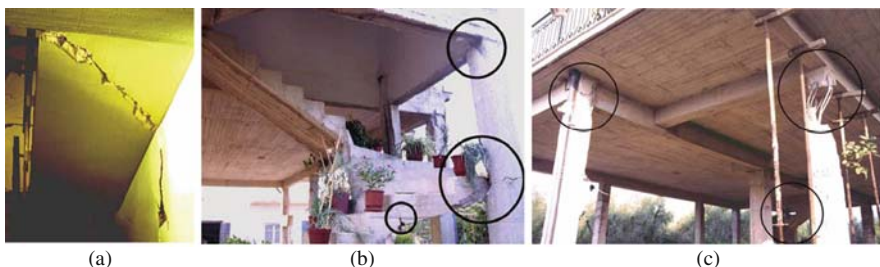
(a) Stair flight failing in shear as an inclined wall element in its strong direction; (b) corner stair in an open ground floor causes damage to the column it is connected to at mid-storey; and (c) columns at the diagonally opposite corner of the building failed during torsional response due to the stair in (b) – shown near bottom right at the back. (See also Plate 4 in the Colour Plate Section on page 719)
